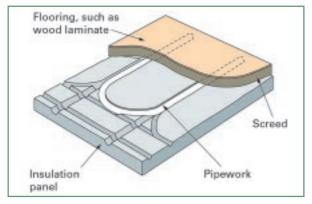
A underfloor heating system using screed over preformed insulation panels. ©BSRIA.
